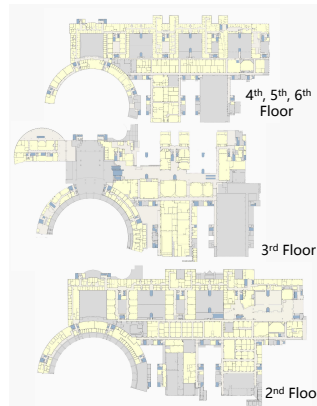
Floor map of HKUST campus (4th ~ 6th floors have the similar floor map).
